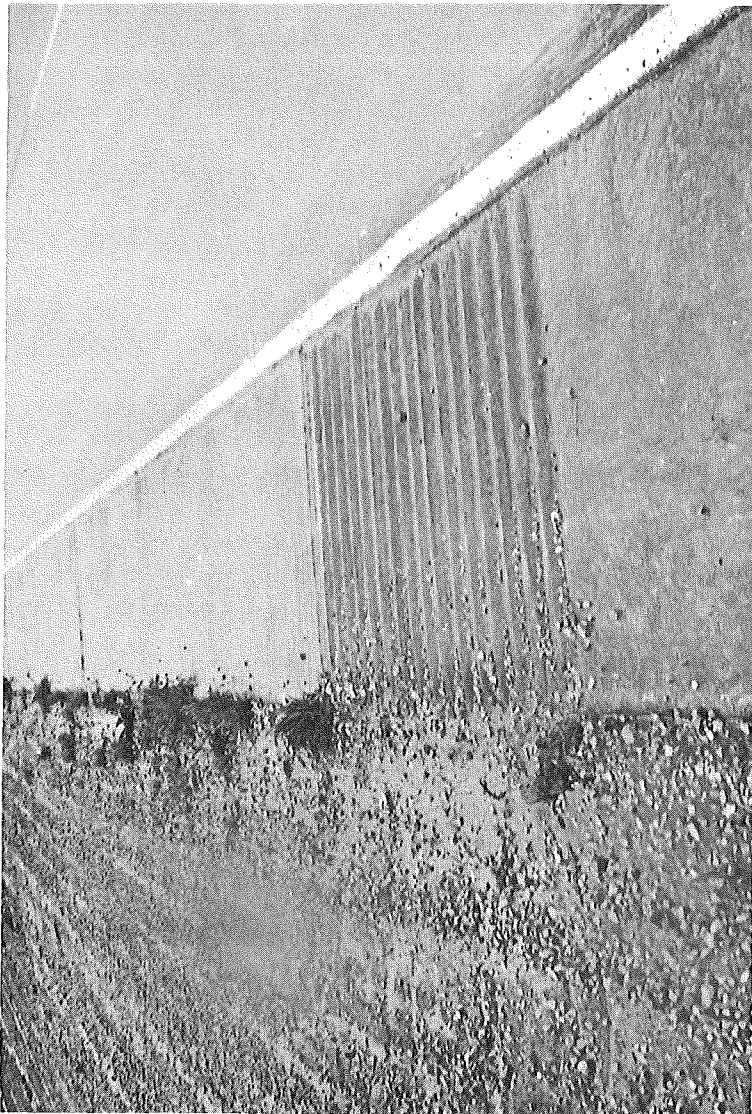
(above). Portland cement concrete shoulder on median side of roadway. Note edge line and rumble strip.
